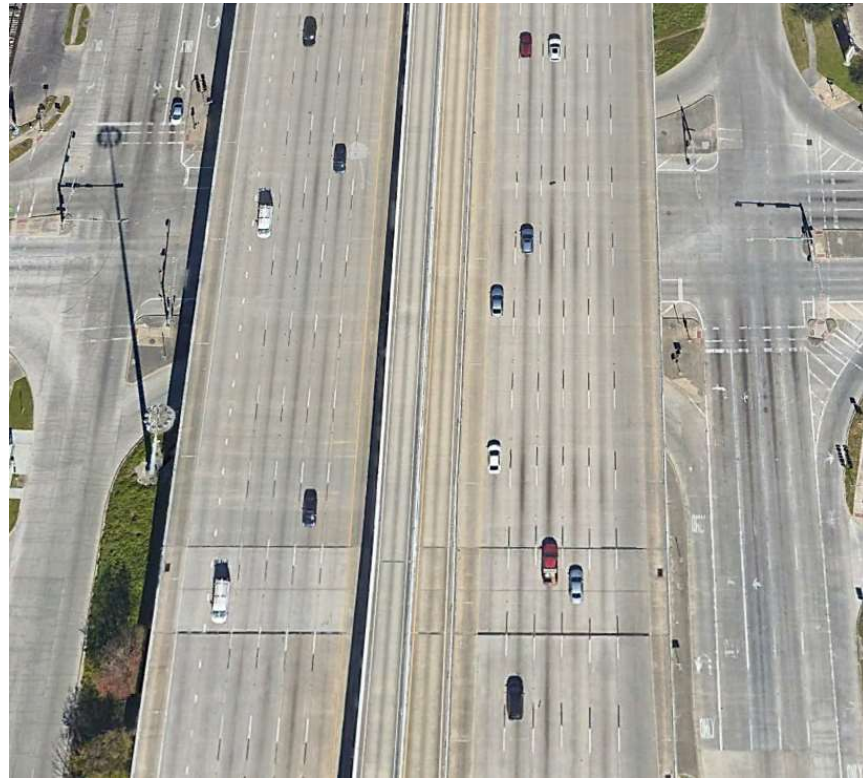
Texas U-Turn interchange plan view configuration at I-69 and Collingsworth Street
